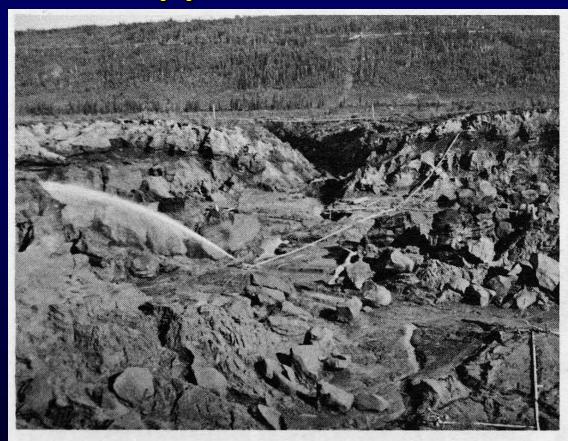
This is a view of Cripple stripping, with pipe suspension bridge and Chena ditch visible in the background. (Boswell 1979)
